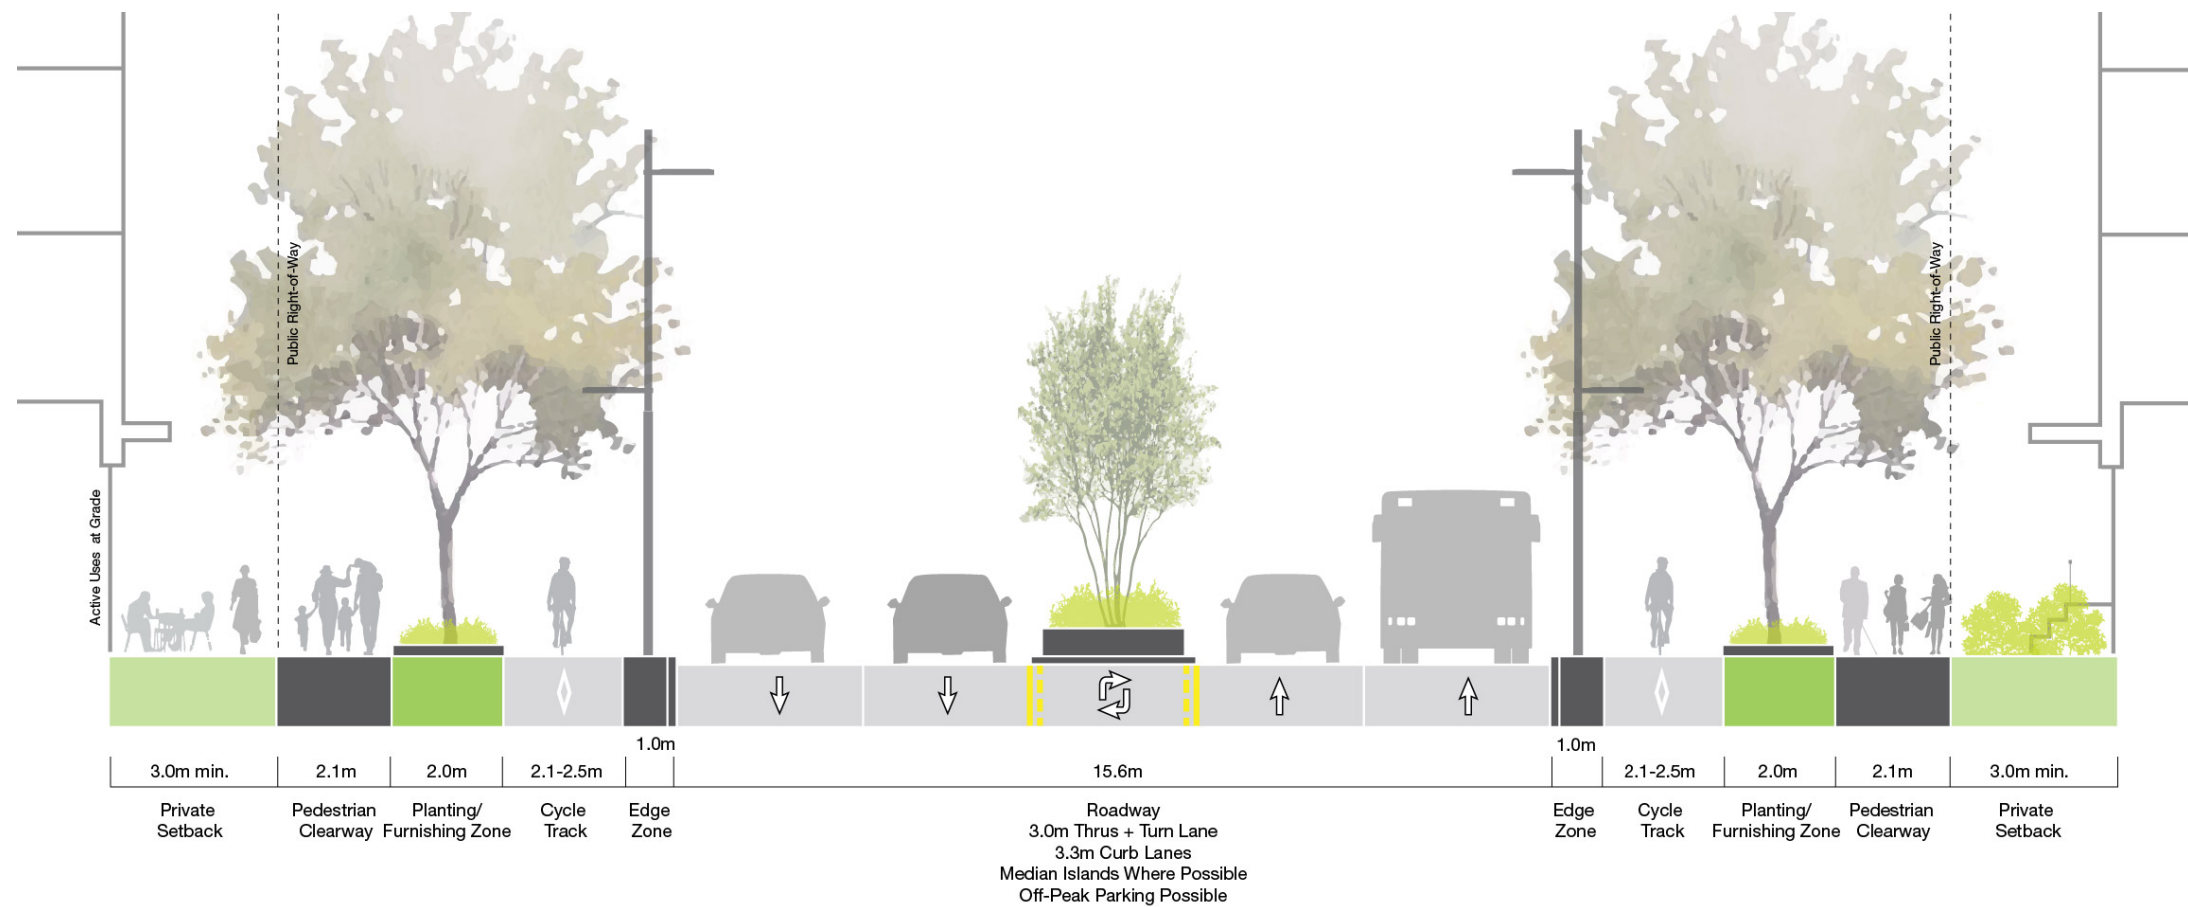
Consilium Place, Grangeway Avenue Cross Section 30m ROW
